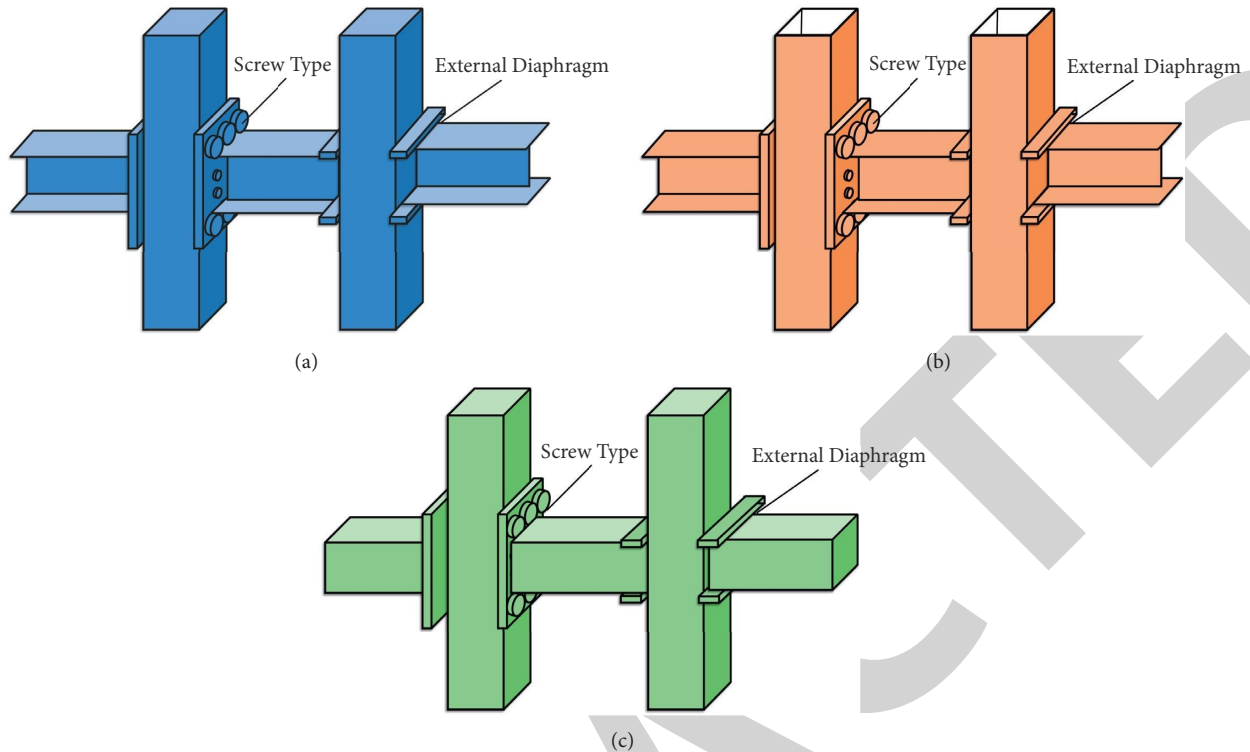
Model diagrams of six types of simulated combination modes: (a) steel tube column and steel beams; (b) CFST columns and steel beams; (c) CFST columns and steel-tube-beam.
